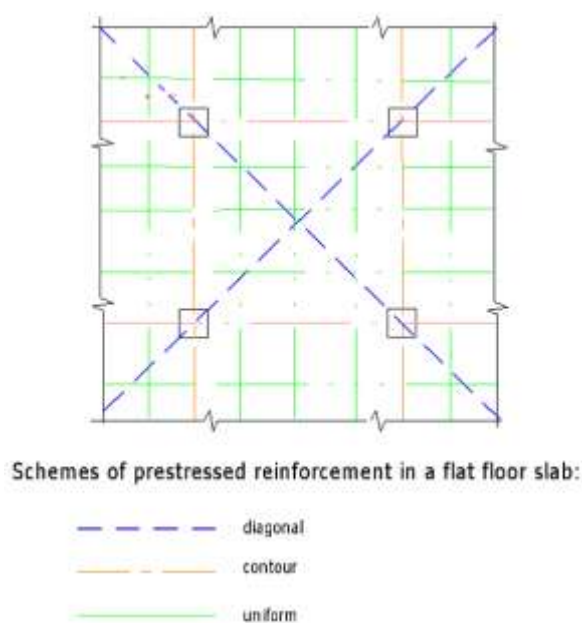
Schemes of prestressed reinforcement in a flat floor slab
